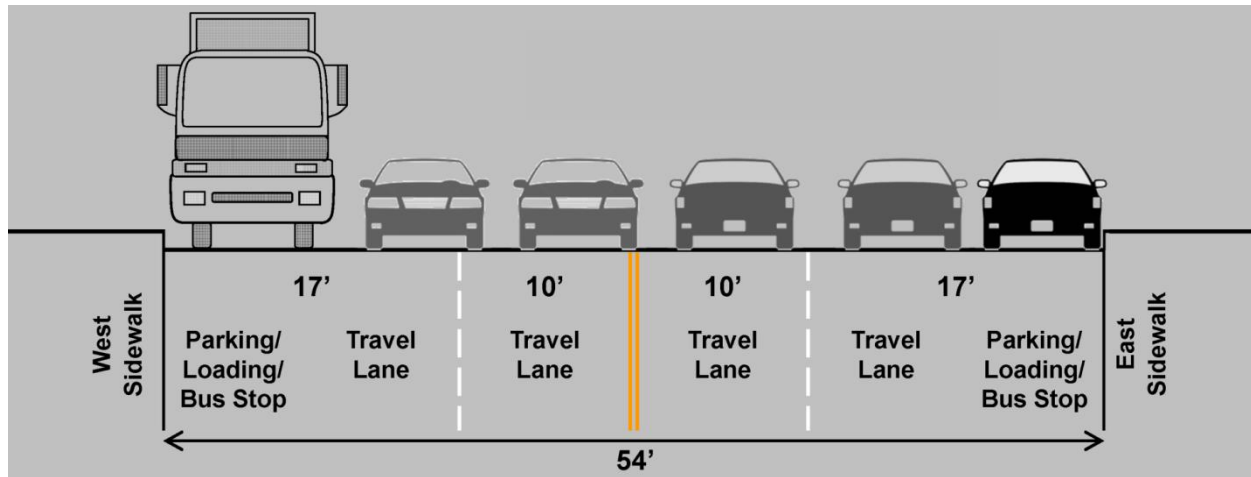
Pre-Improvement Cross Section between Lincoln Road and East 26th Street
